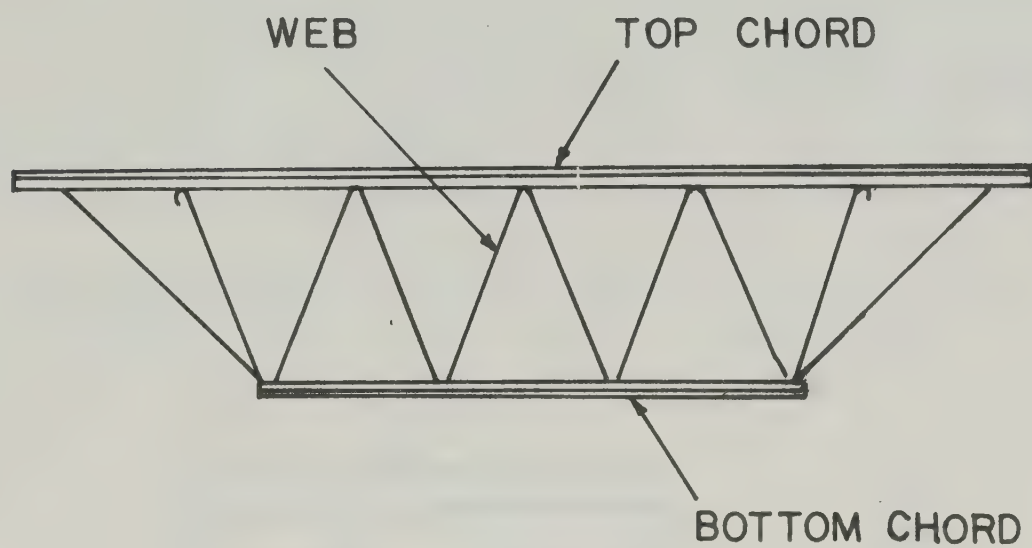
TYPICAL OPEN WEB STEEL JOIST
